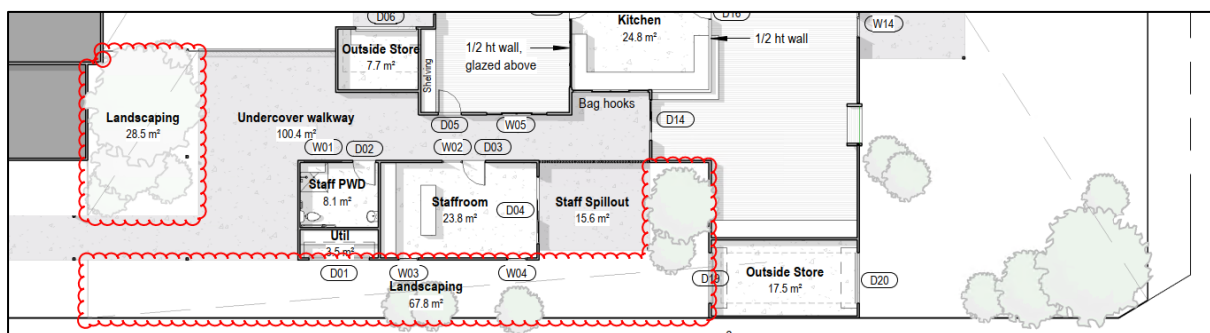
Site Plan – Marked Up – Proposal Plans (Source: NEArchitecture 2024)
